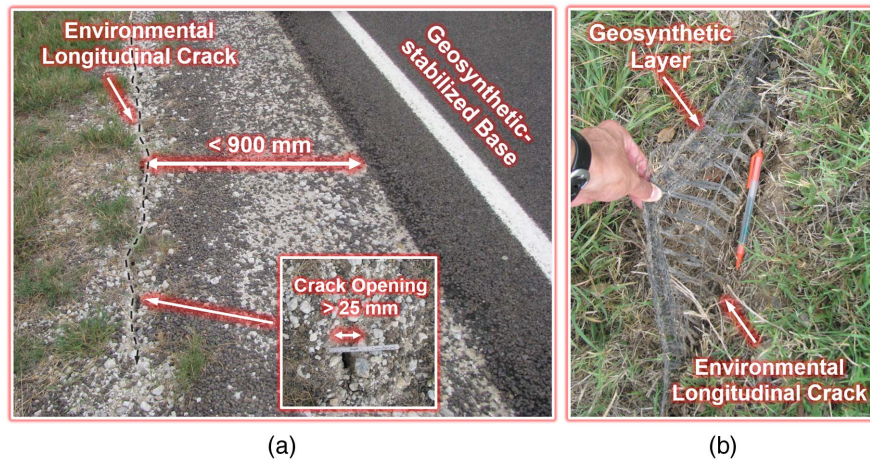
Field investigation of environmental longitudinal crack outside the pavement: (a) crack location in the geosynthetic-stabilized section; and (b) exposed geogrid in the crack opening.
